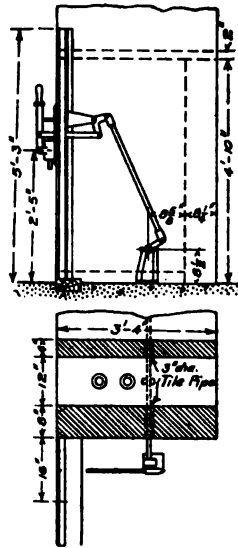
Detail of Oil Switch Pipe Mechanism.
